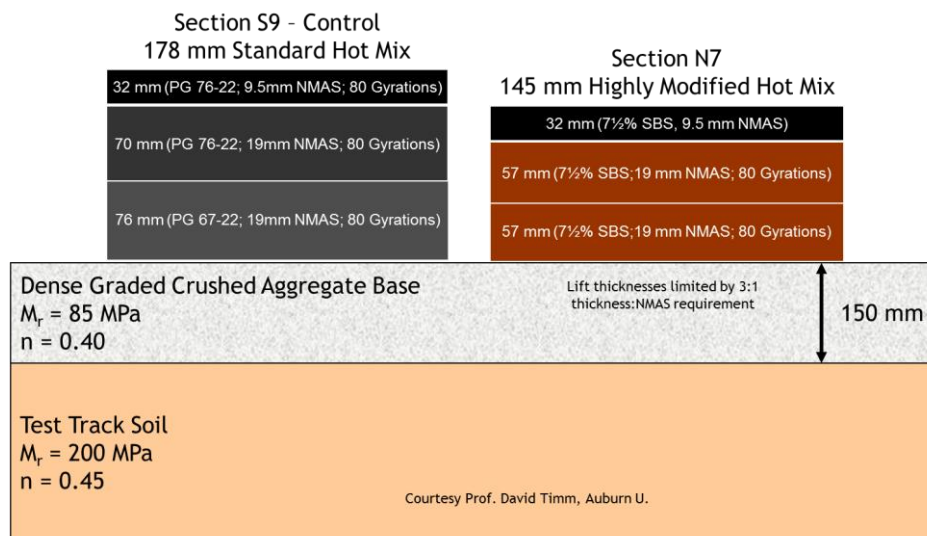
Pavement Design for NCAT Sections N7 and S9.
